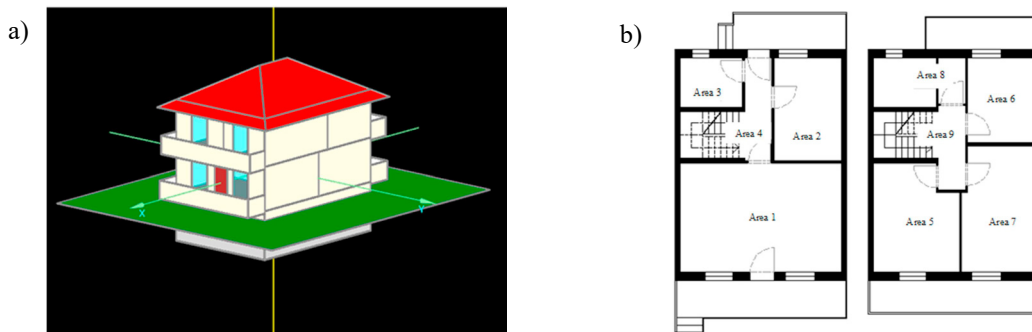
(a) Test Building; (b) floor plan of the Test Building.
